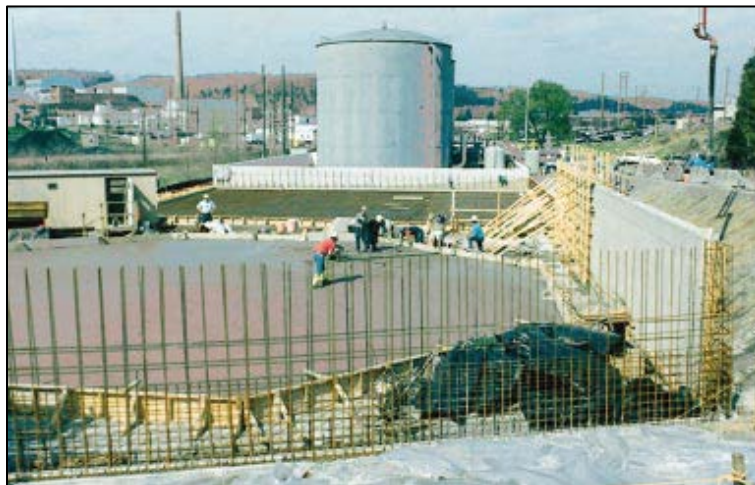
Construction of Concrete Basin at Oak Ridge[43]
